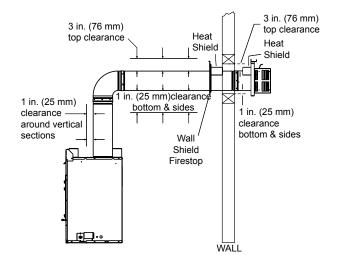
Horizontal Venting Clearances to Combustible Materials - Top Vent
